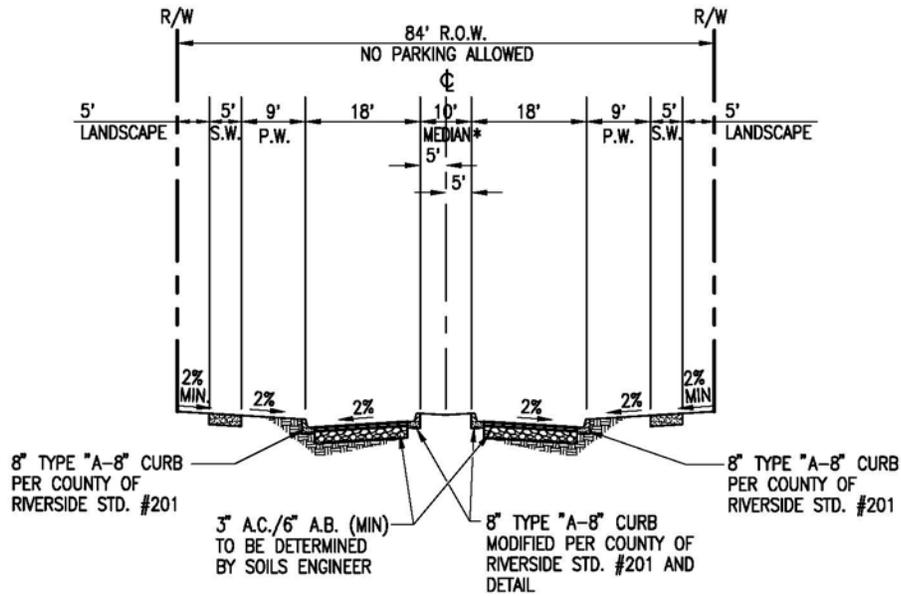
Summerly Modified Neighborhood Street ("ELSP Collector") Cross-Section
